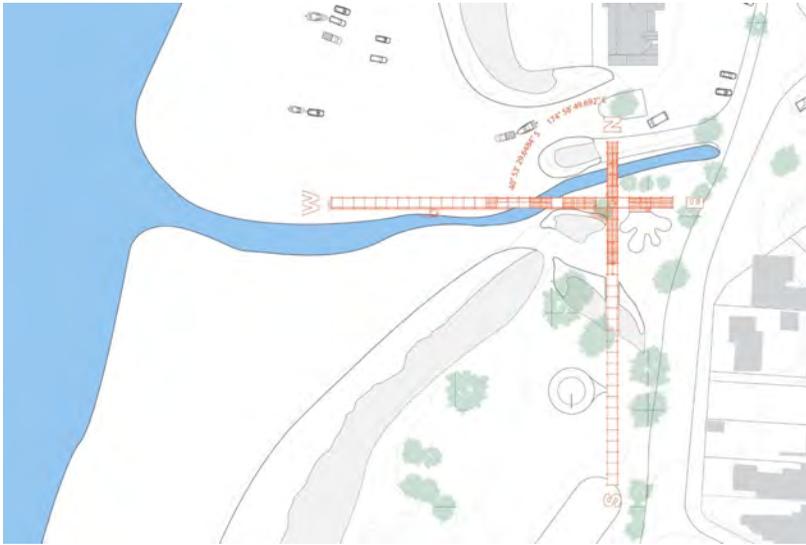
Site plan showing orientation to the compass and connections between car park (north), green park and shops (south), street (east), and beach (west). Not to scale.
